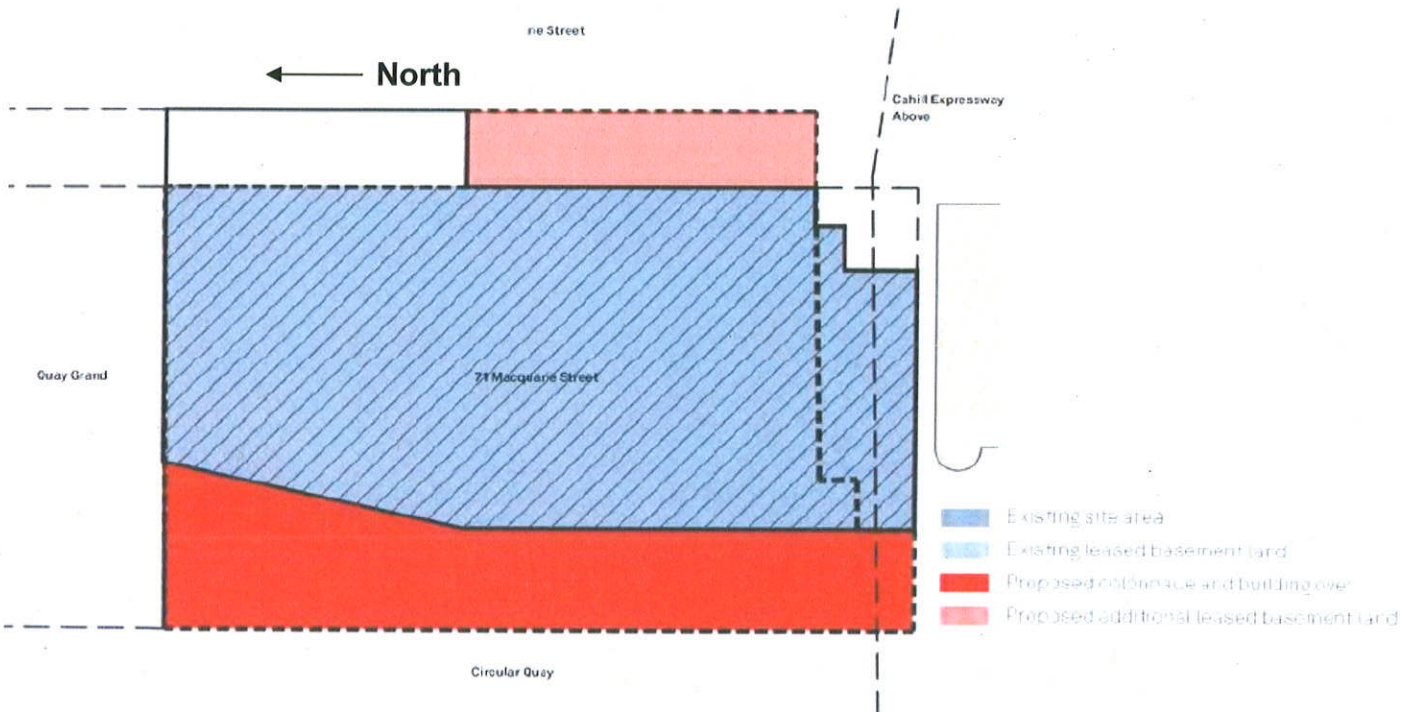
The proposed western extension of the building envelope in plan - shown in red (Source: Proponent's EA)
